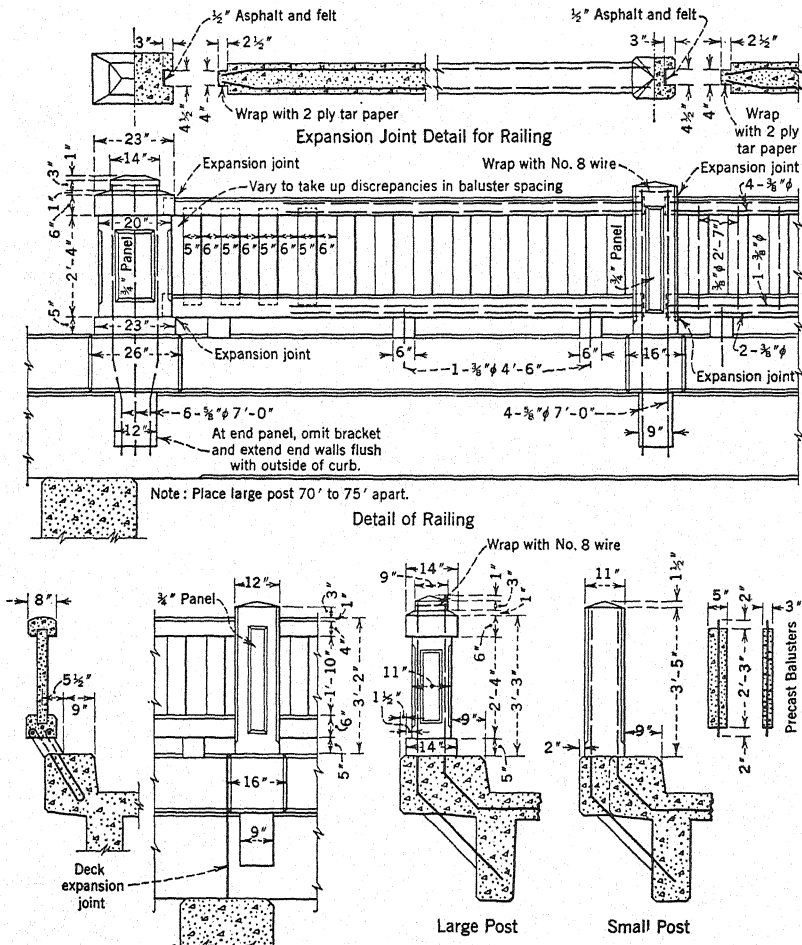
Railing for Bridge over Savannah River. (See p. 393.)
